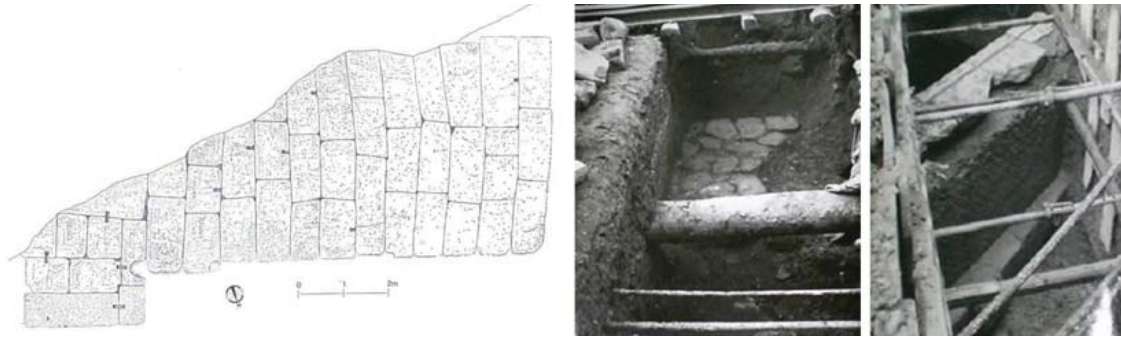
Remains of the river quay at the Milvio bridge, (Virgili, 1983) (left); Via Flaminia, Ponte Milvio, stone paving of the roman road, and masonry constructions with a different orientation in the lower layer, (right).
